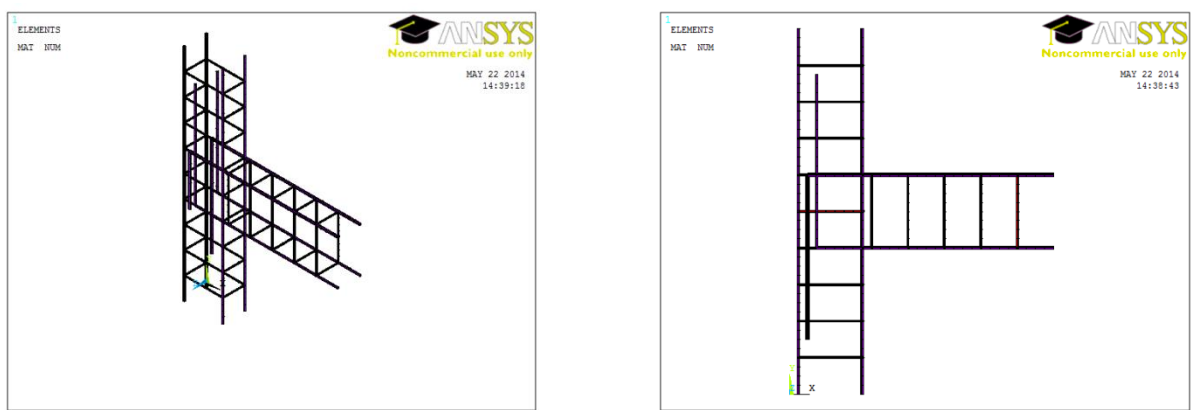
Reinforcement Modelled for the Exterior Beam-Column Joint B1
